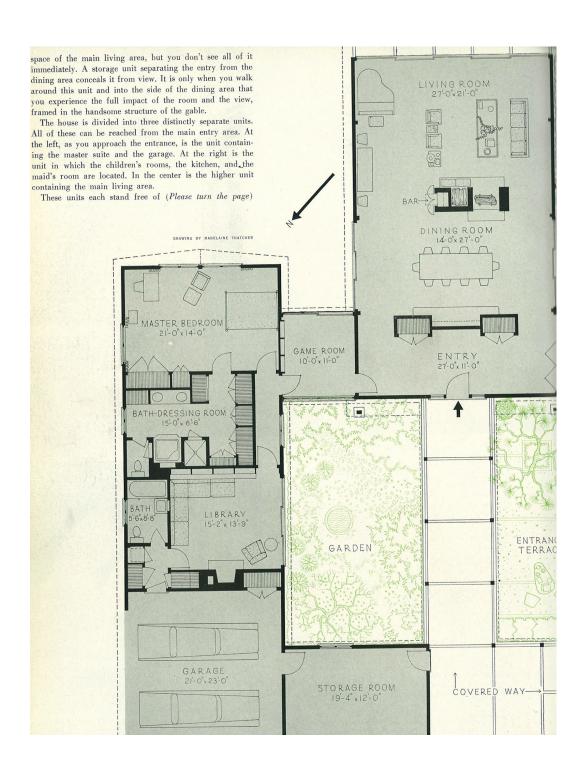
Floor Plan, Mark Mills, "House Plans." House Beautiful, October 1963: 196-197.
